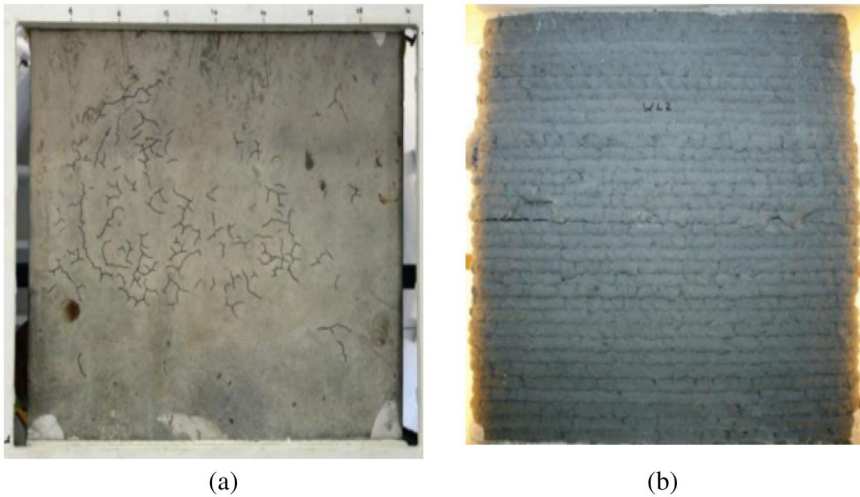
Post-blast faces of (a) casted wall and (b) printed wall [98].
